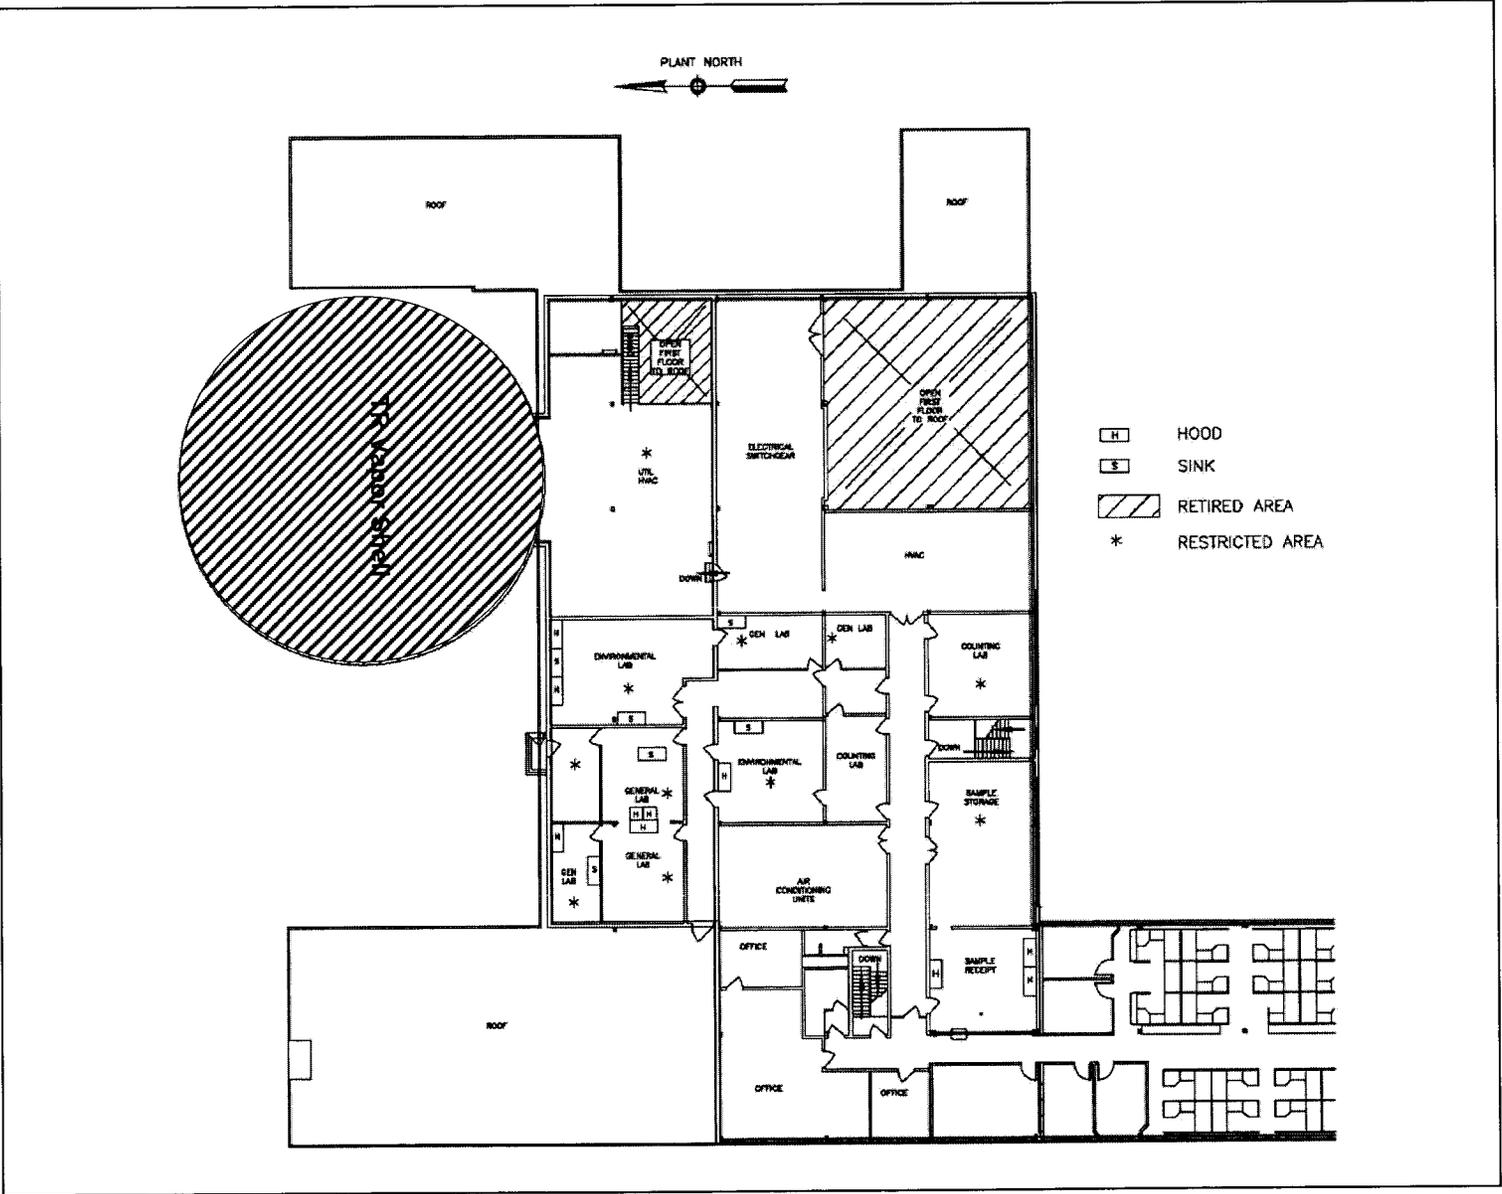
Analytical Laboratories – Second Floor G Building North Wing
